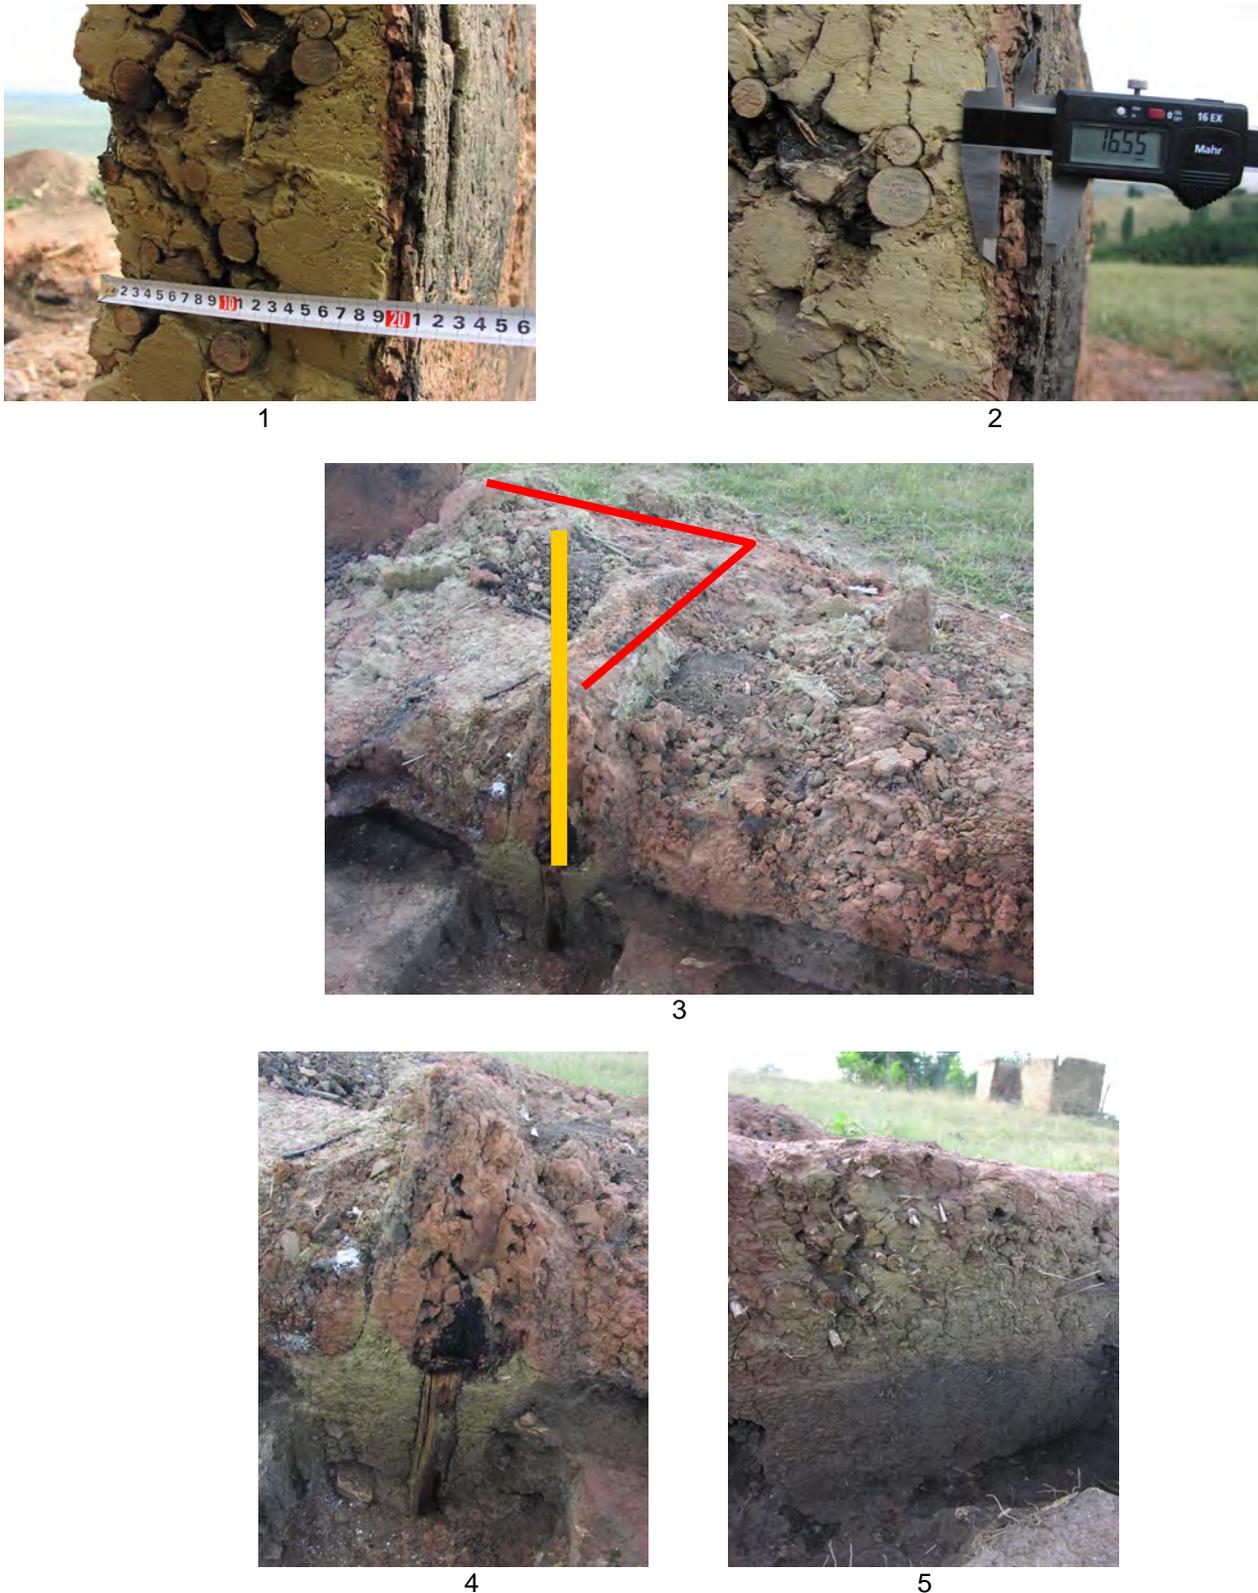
The intentional burning. Dwelling No. 2 six months after the fire. 1: section detail inside the western wall, at 1.35 m above the base; 2: section detail inside the western wall, at 1.5 m above the base; 3: cross-section through the collapsed east wall (the red lines indicate the directions of the walls and the yellow outlines the post within the bearing structure of the wall); 4: the hole and the post inside the eastern wall with the base of the wall visible in elevation; 5: cross section through the remains of the east wall collapsed outside the dwelling.
